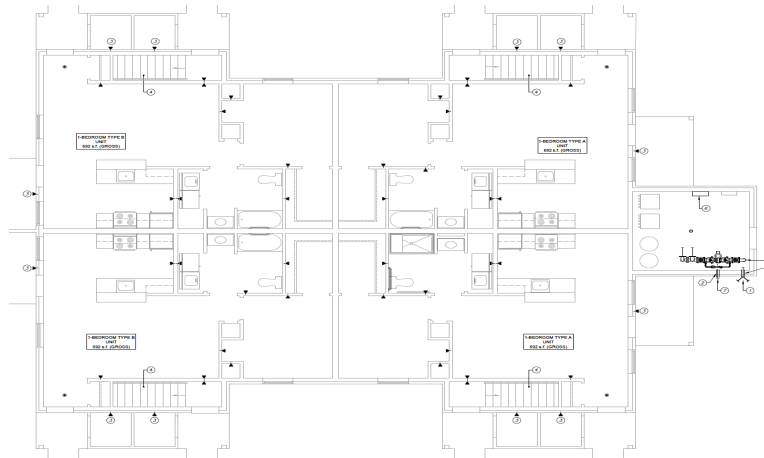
8-Plex First Floor Plans [Credit: SWBR Architects]
